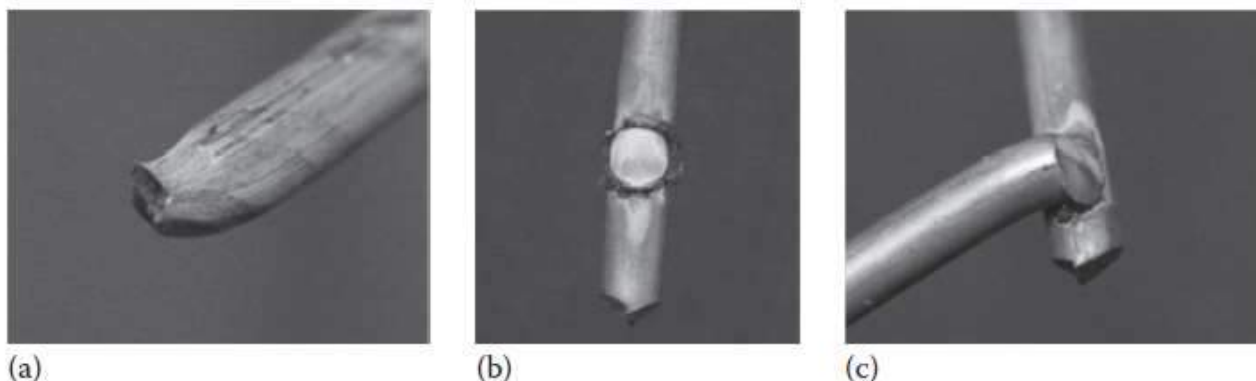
Welded wire mesh failure mechanisms. (a) tensile wire failure, (b) weld failure, and (c) failure of the wire through the HAZ. (From Morton, E.C., *Static testing of large scale ground support panels*, MSc thesis, Western Australian School of Mines, Curtin University of Technology, Kalgoorlie, Western Australia, Australia, 2009: 250pp.)
